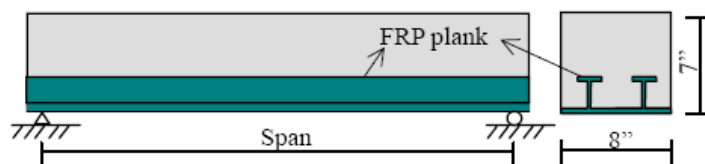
Dimension of fabricated FRP plank reinforced beam specimens (Bank et al., 2006)
